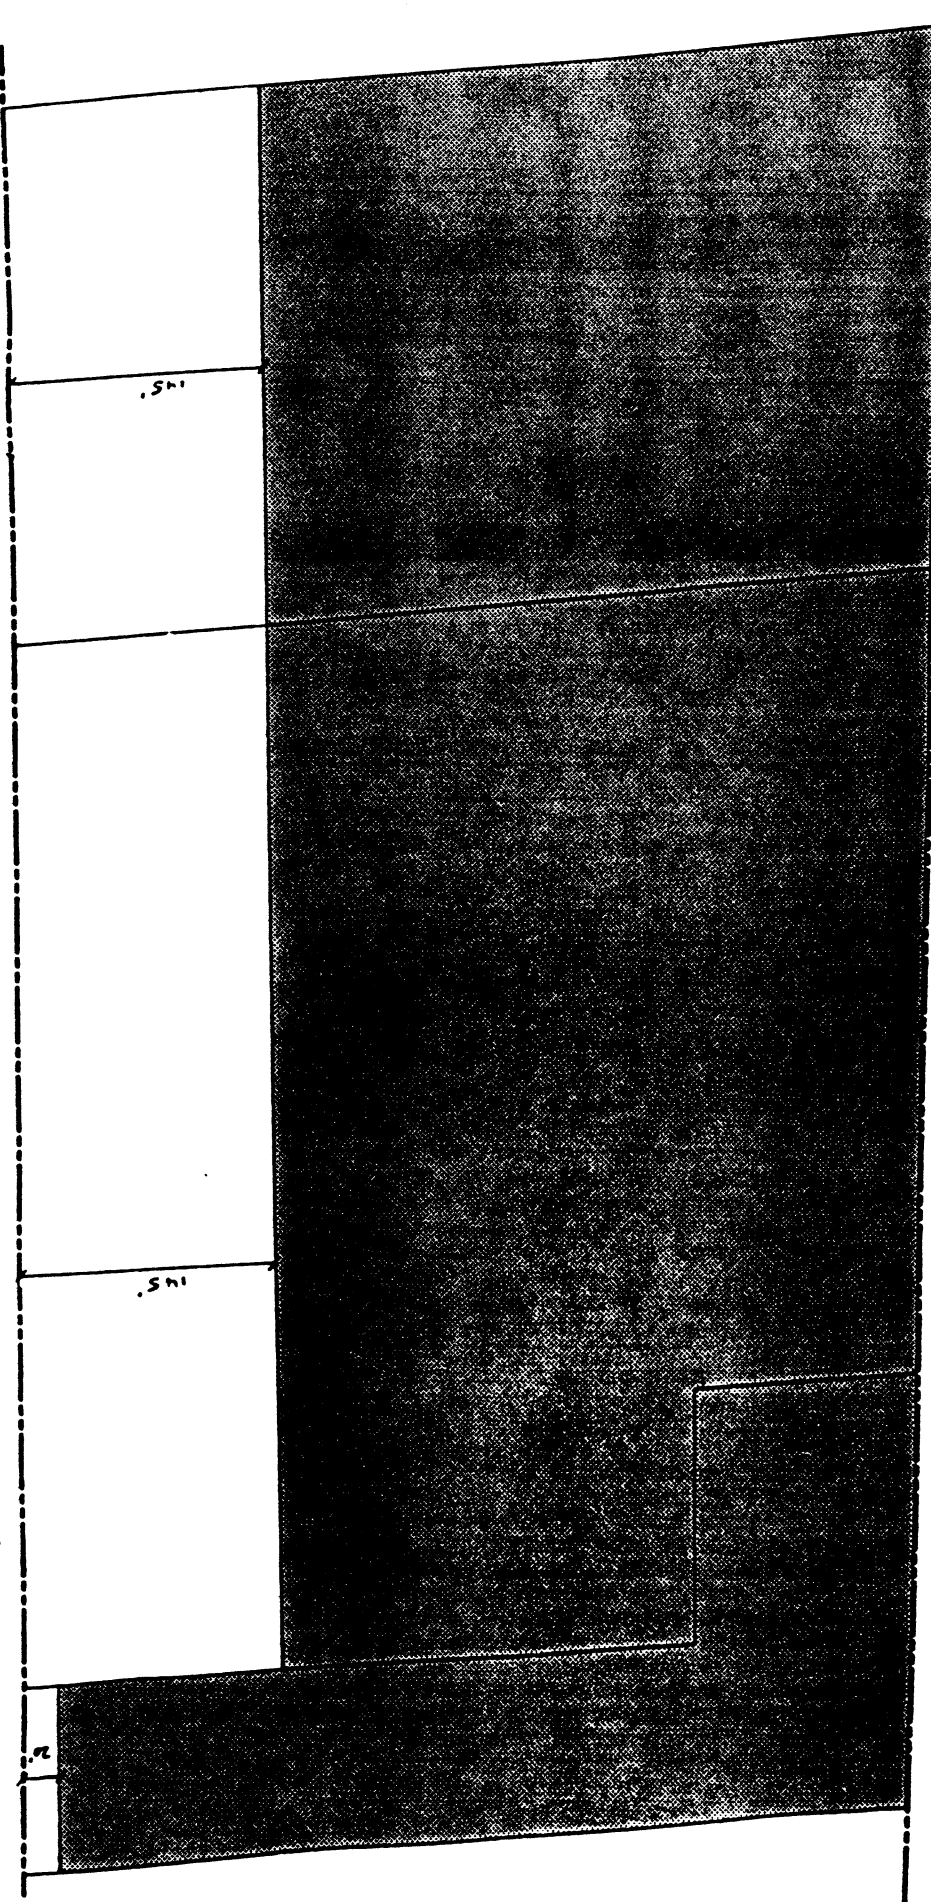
SUBAREA 5, SECTOR B: BUILDING ENVELOPE
